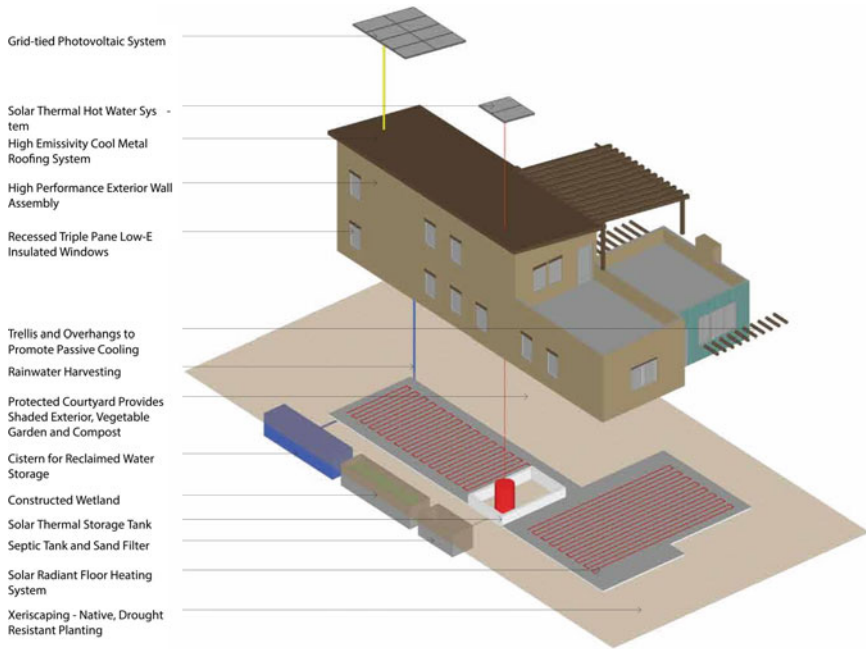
Exploded axonometric drawing showing sustainable features (Drawing Joseph Kunkel)
